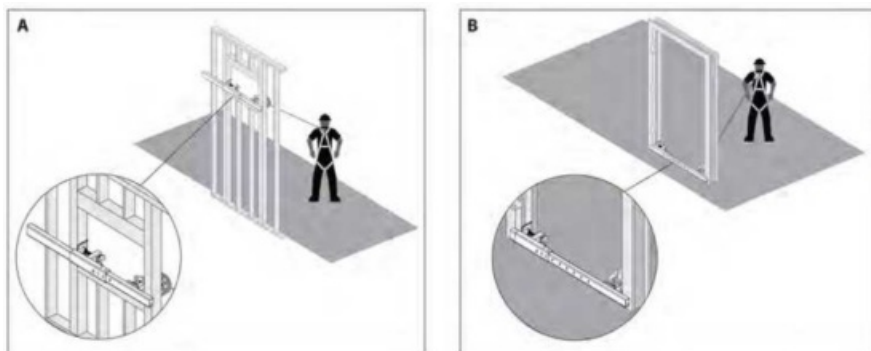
Use of Window/Door Jamb Anchor in Fall Protection
